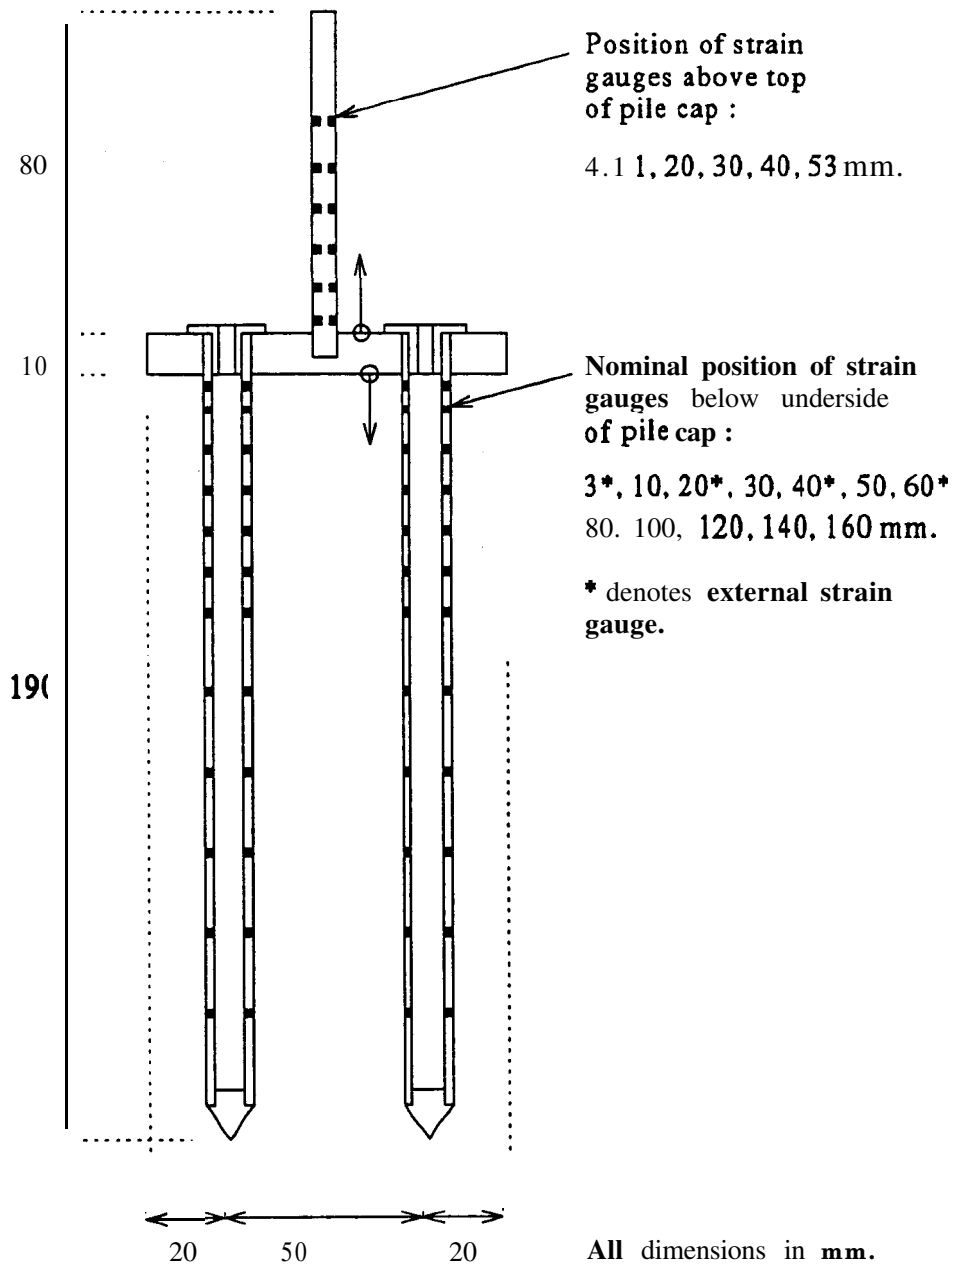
Position of bending moment transducers on model abutment wall & pile group.
